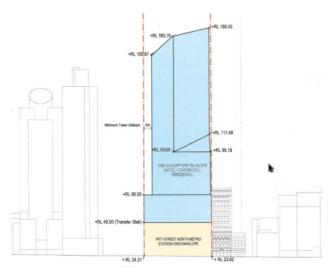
Concept SSD DA - Envelope - East Elevation Source: SSD 8875 Concept Stamped Plans
